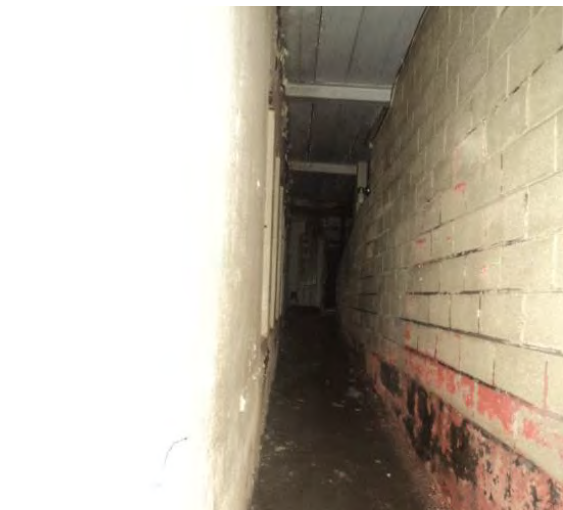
damage at Stair 106 at east side of Organ from roof leak.
